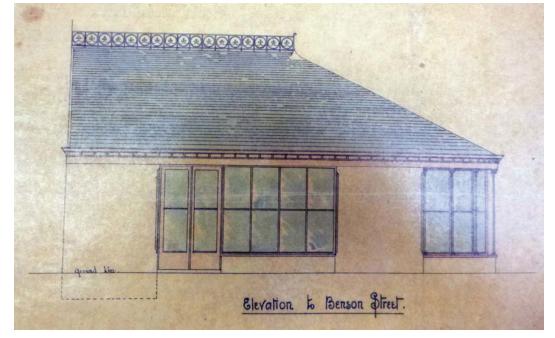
Elevation to Benson Street of the proposed showroom, dated 1873
